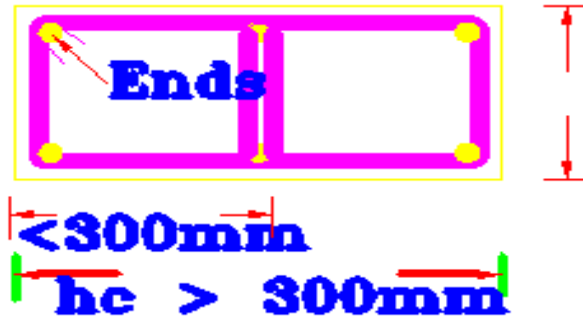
A: Confining hook (distance between longitudinal bar should not exceeds 300 mm)
